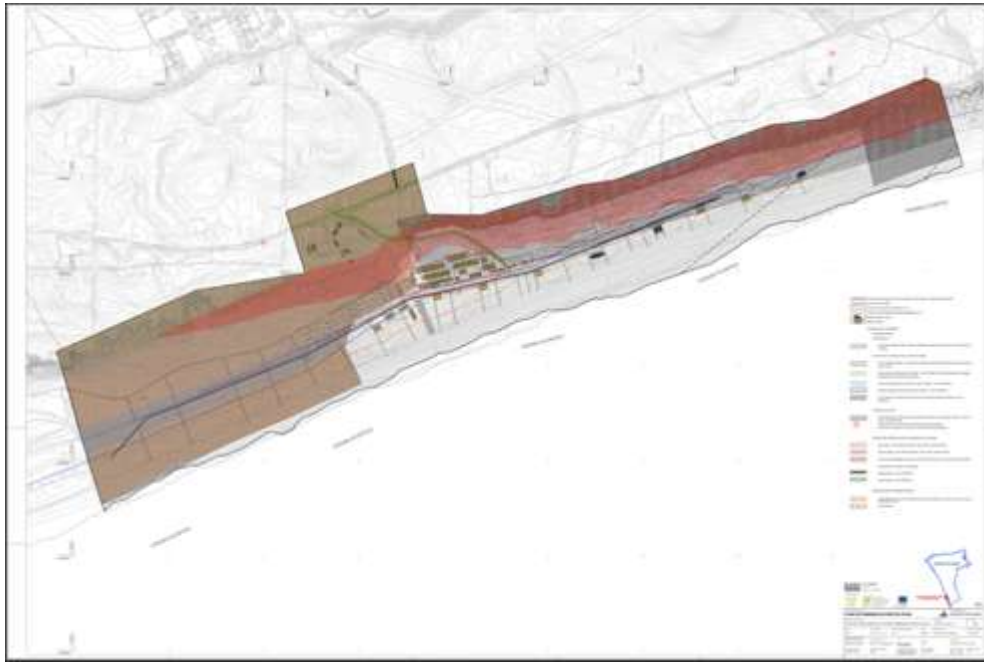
Conditioning Plan- Plano Pormenor de Fonte da Telha. March, 2015. Source: Camara Municipal da Almada
